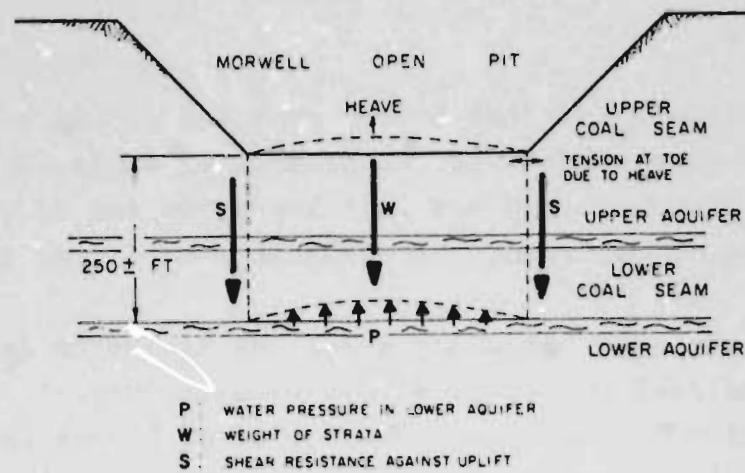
Pit floor heave mechanism (from Brawner, 1974, p. 764).
